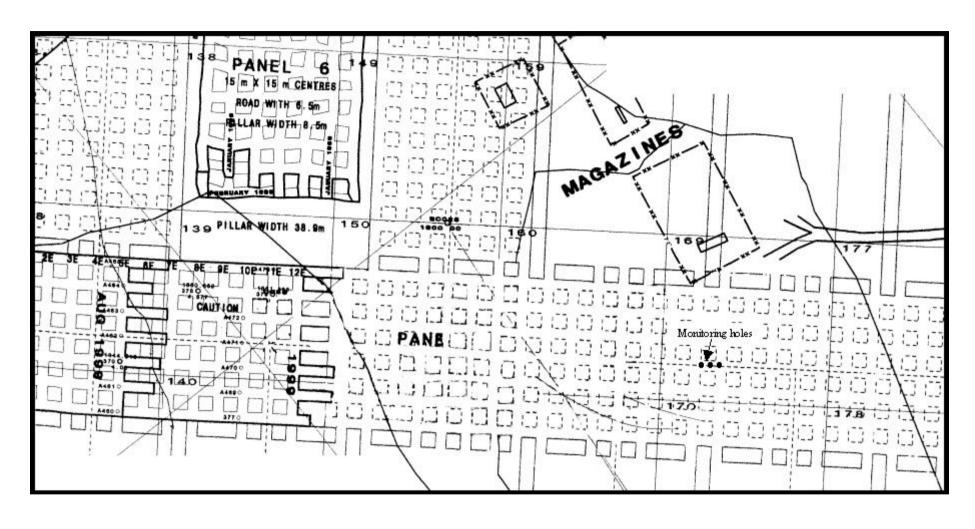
Section plan Colliery 'D' Site 1 (not scaled)
